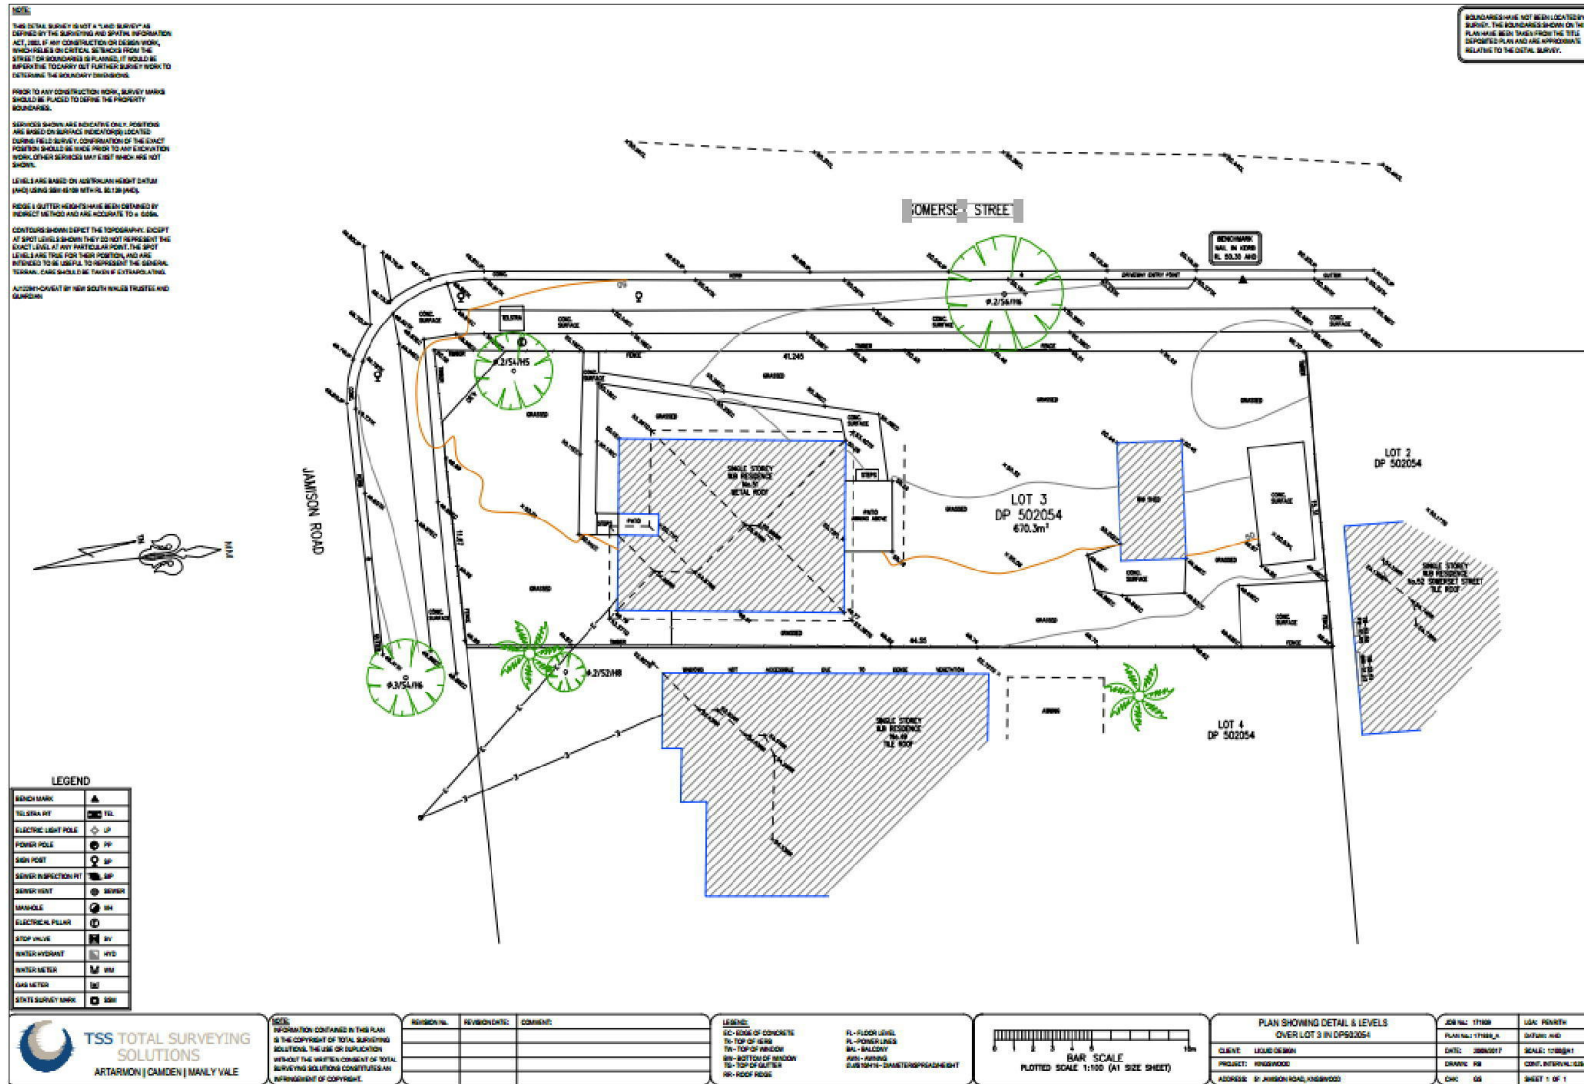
Survey plan – 51 Jamison Road, Kingswood
